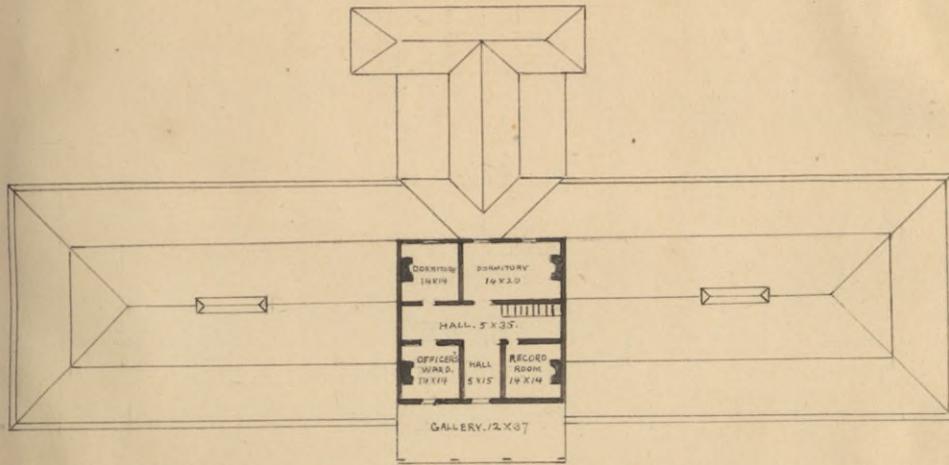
PLAN OF HOSPITAL - SECOND FLOOR.
